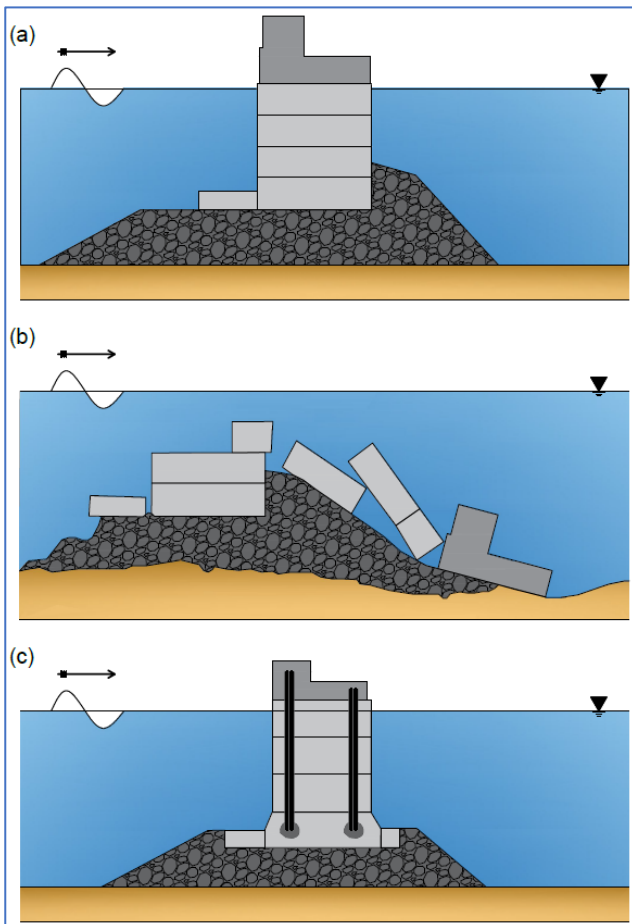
Cross-Sections of the Outer Breakwater of the Port of Catania: (a) typical cross-section as it appeared in 1932; (b) cross section following the destruction caused by the sea storm on March 26th, 1933. (c) typical cross-section of a vertical breakwater, highlighting the inclusion of metal components for vertical structural connections between the blocks, which were absent in the Catania Outer Breakwater. The sketches have been adapted from Cunningham (1935).
